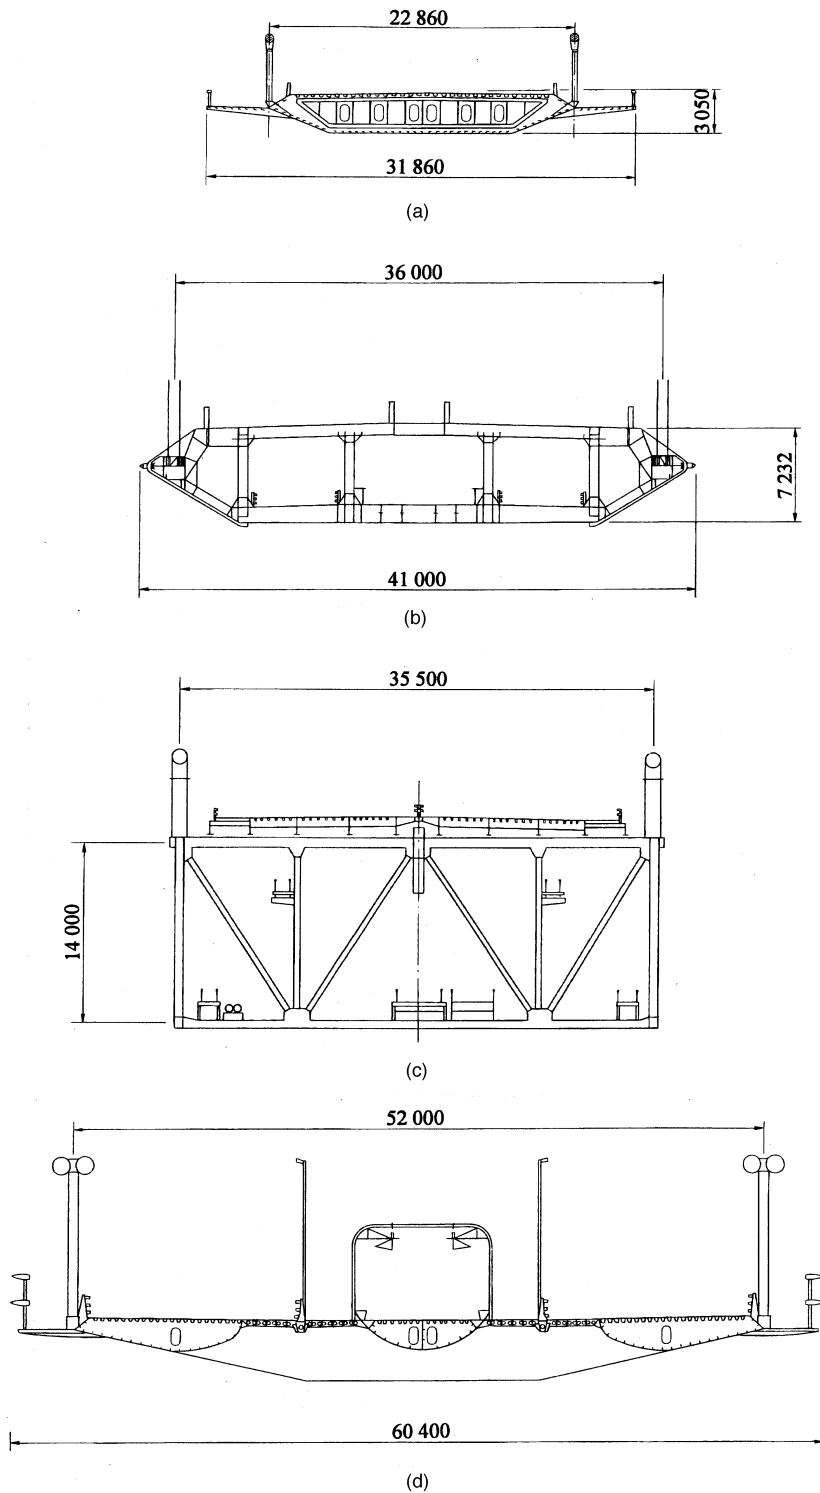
Cross sections through stiffening girders. (a) Severn Bridge, (b) Tsing Ma Bridge; (c) Akashi Kaikyo Bridge, (d) Messina Straits Bridge.
